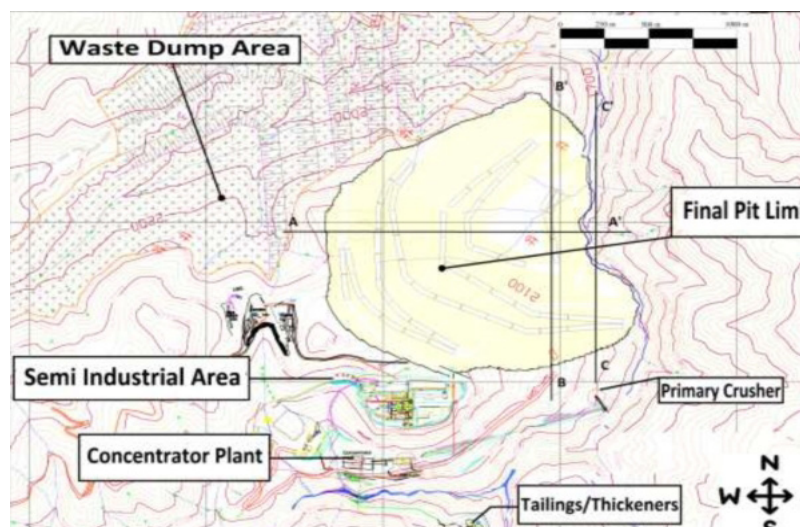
Plan view of Sungun mining site (2021/extraction stage)
